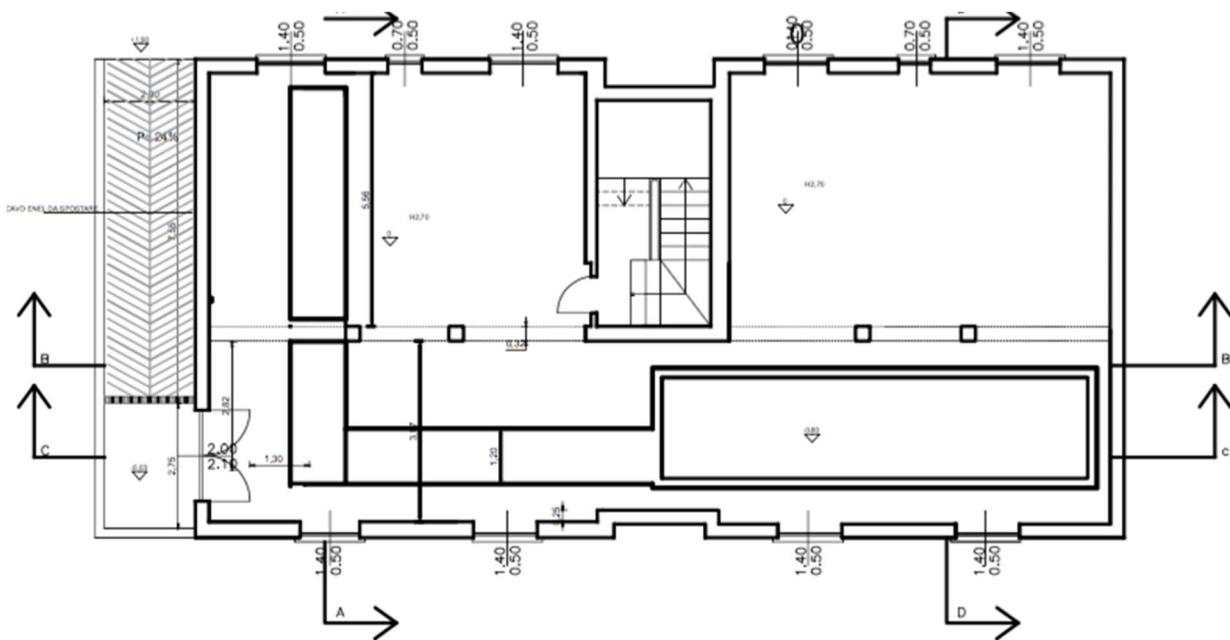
detailed plan of the new laboratory that will house BEaTriX. An external ramp (on the left side) will be built to allow us an easy access to the lab from outside and introduce the vacuum components.
